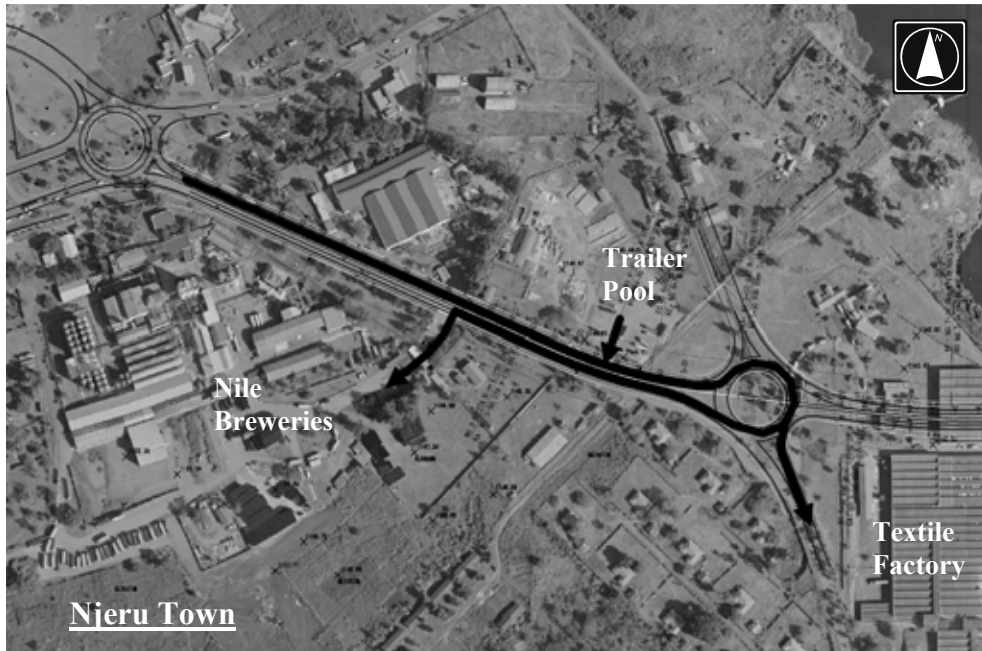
Feeder Road Plan at Jinja (Consolidated Plan for No.3, No.4 and No.5)
